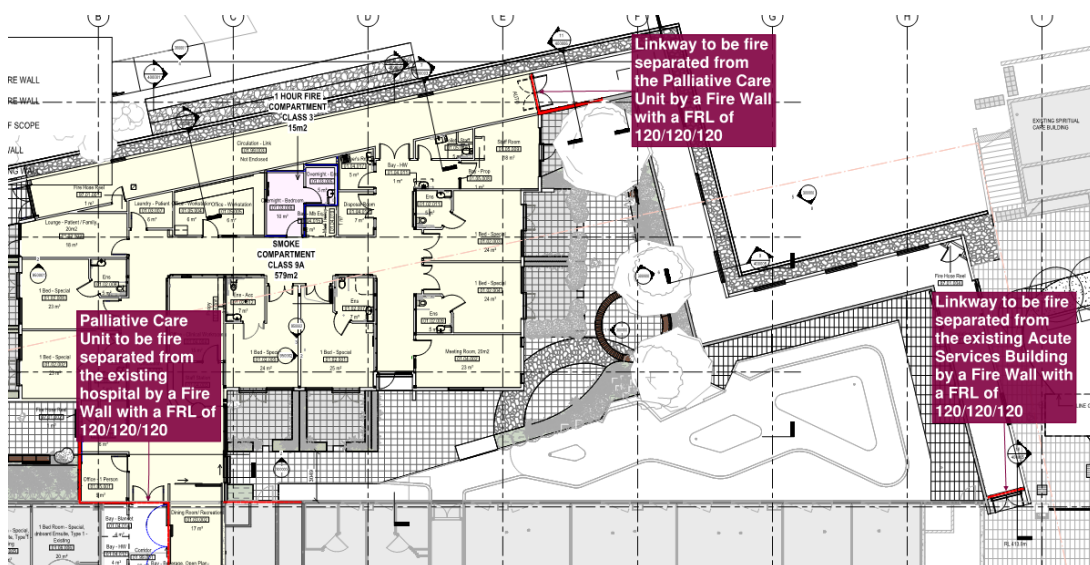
Required fire separation of the proposed Palliative Care Unit from the existing building and Linkway on the Ground Floor
